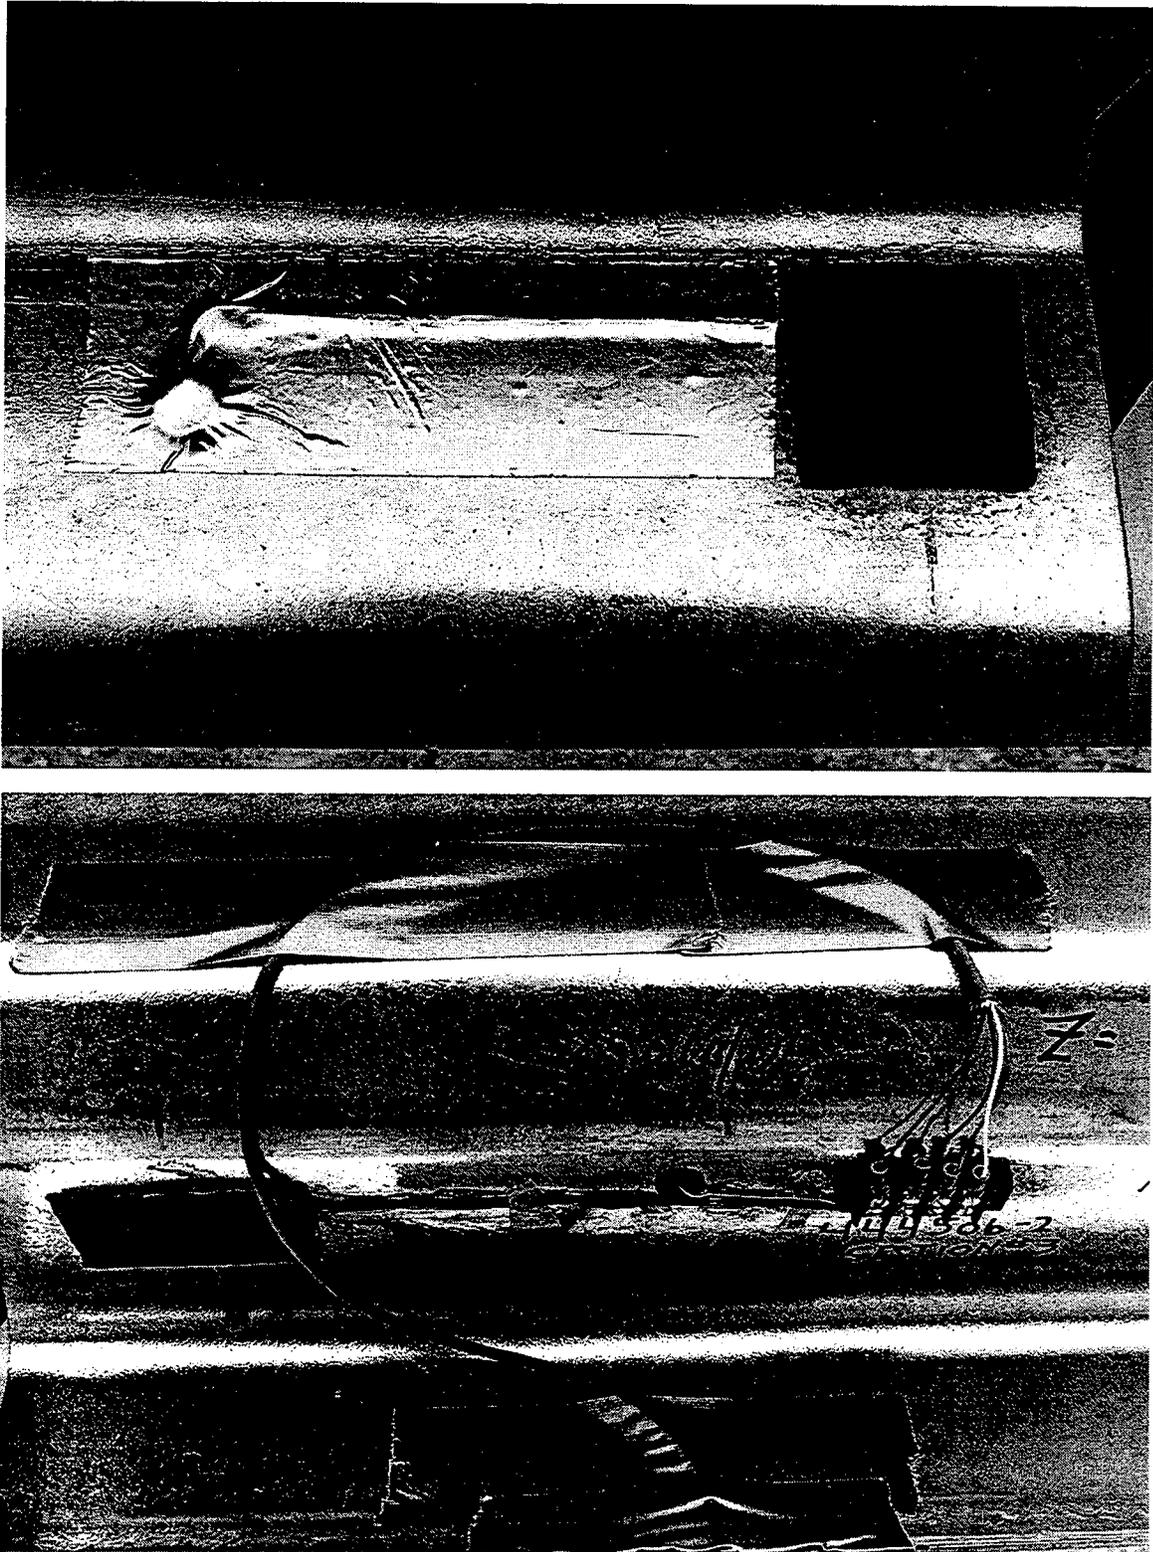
Strain gage installation on W-beam rail for test 473750-4.
